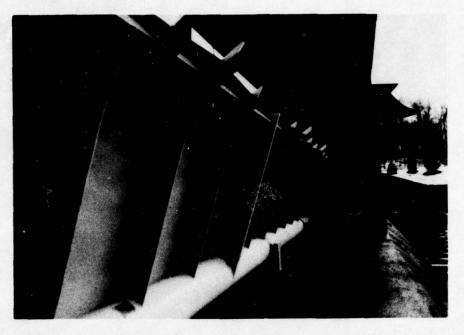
View of Downstream Side of Bascule Gate No. 1 Looking South. Arrow indicates Spalling at Top of Pier.
